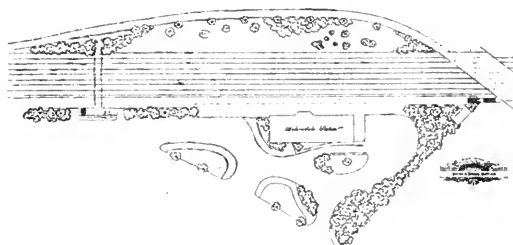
SHRUBBERY TO HIDE FOUNDATION
